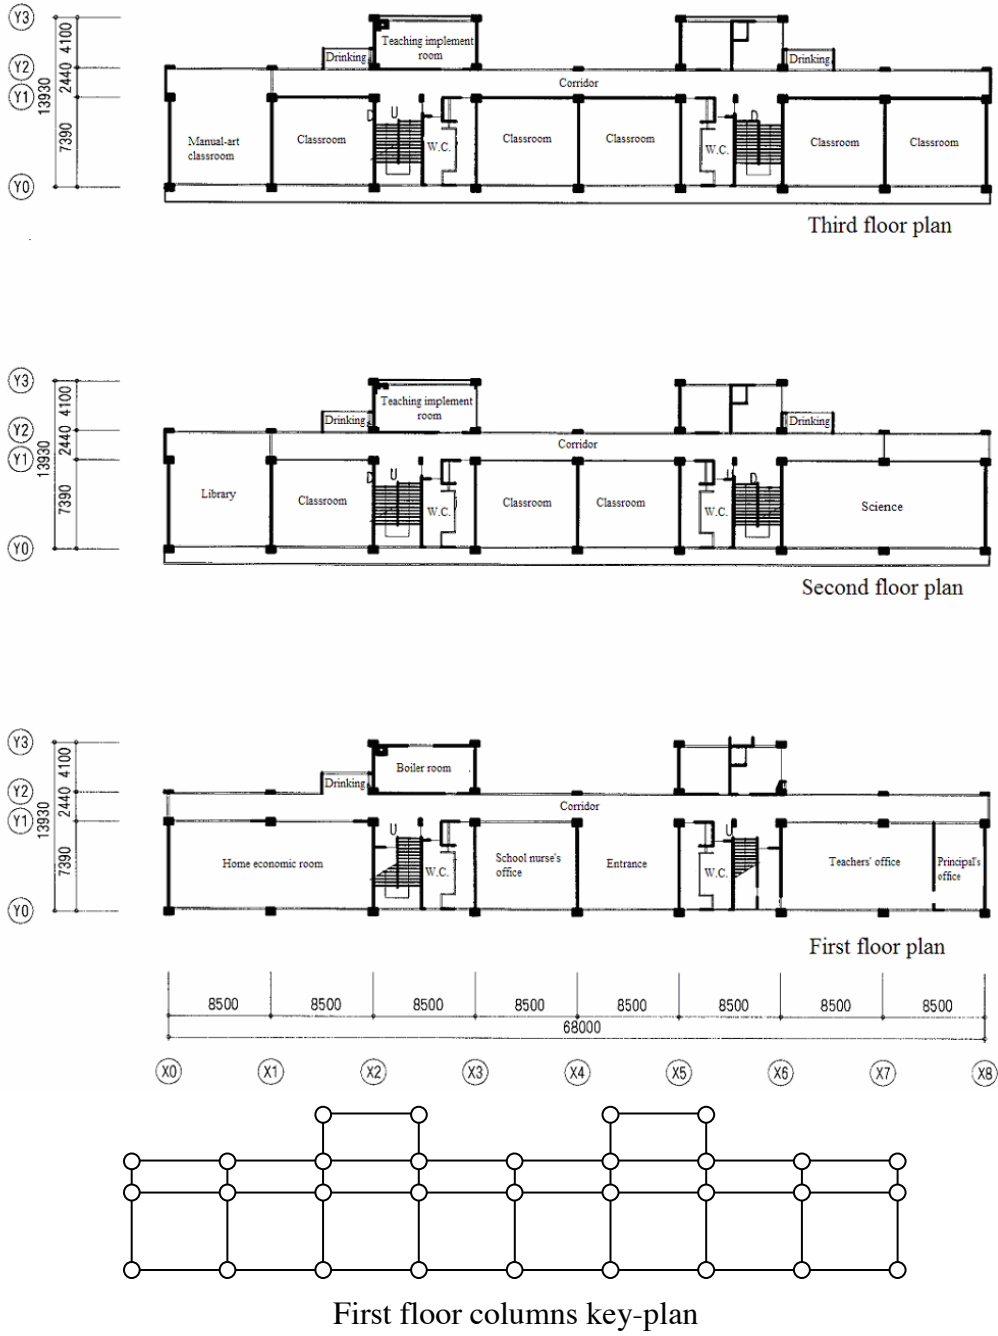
B-1 Plan view and first floor columns key-plan
